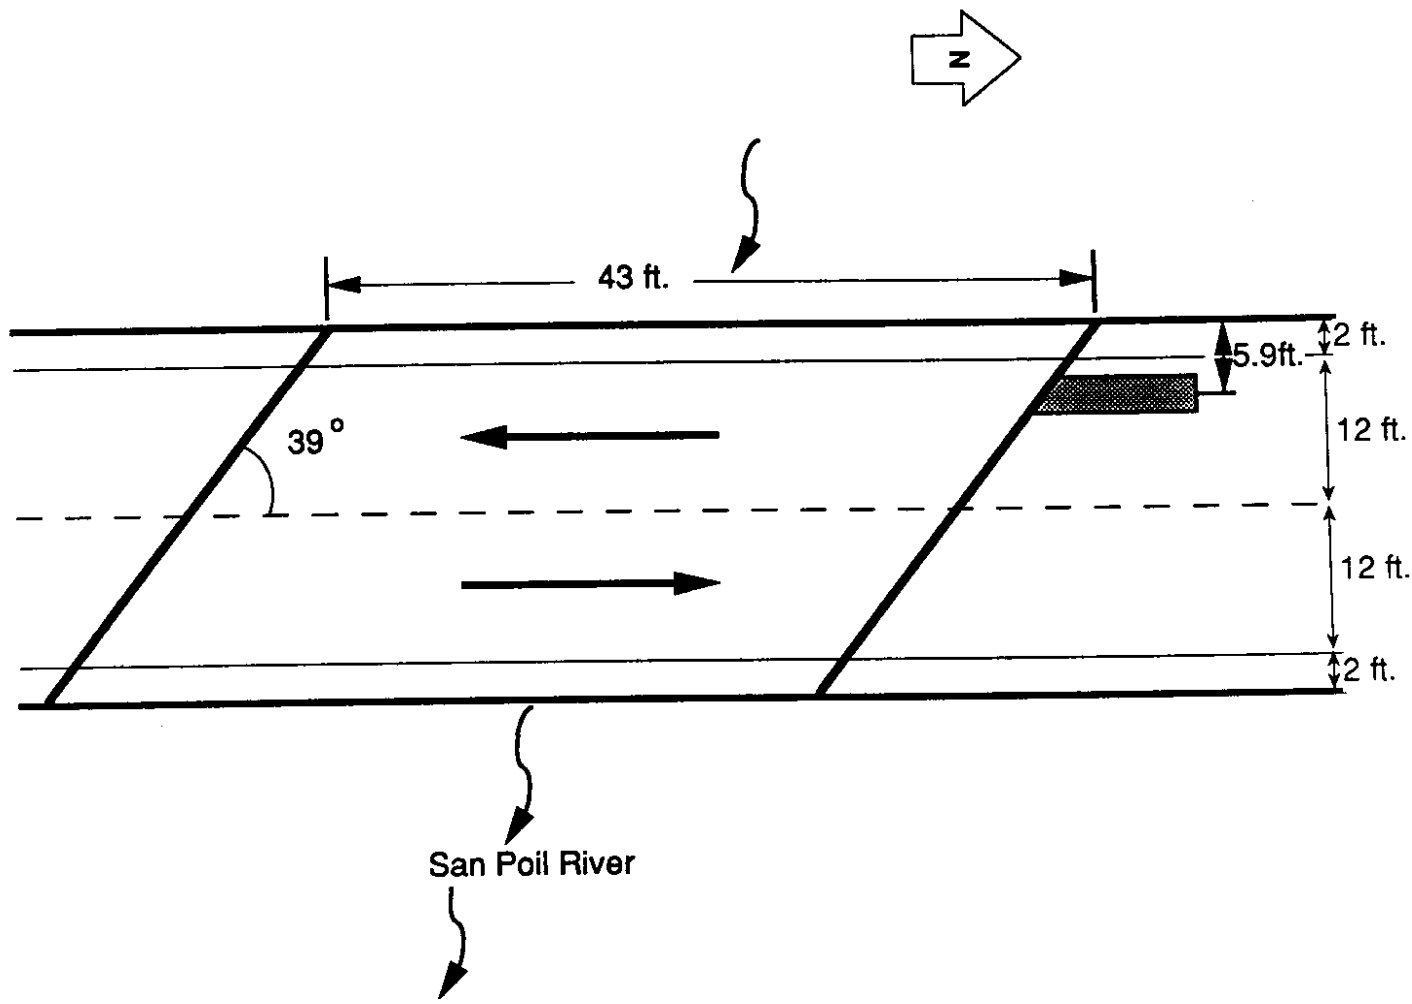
Location of Test Section in Southbound Lane of San Poil River Bridge M.P. 123
